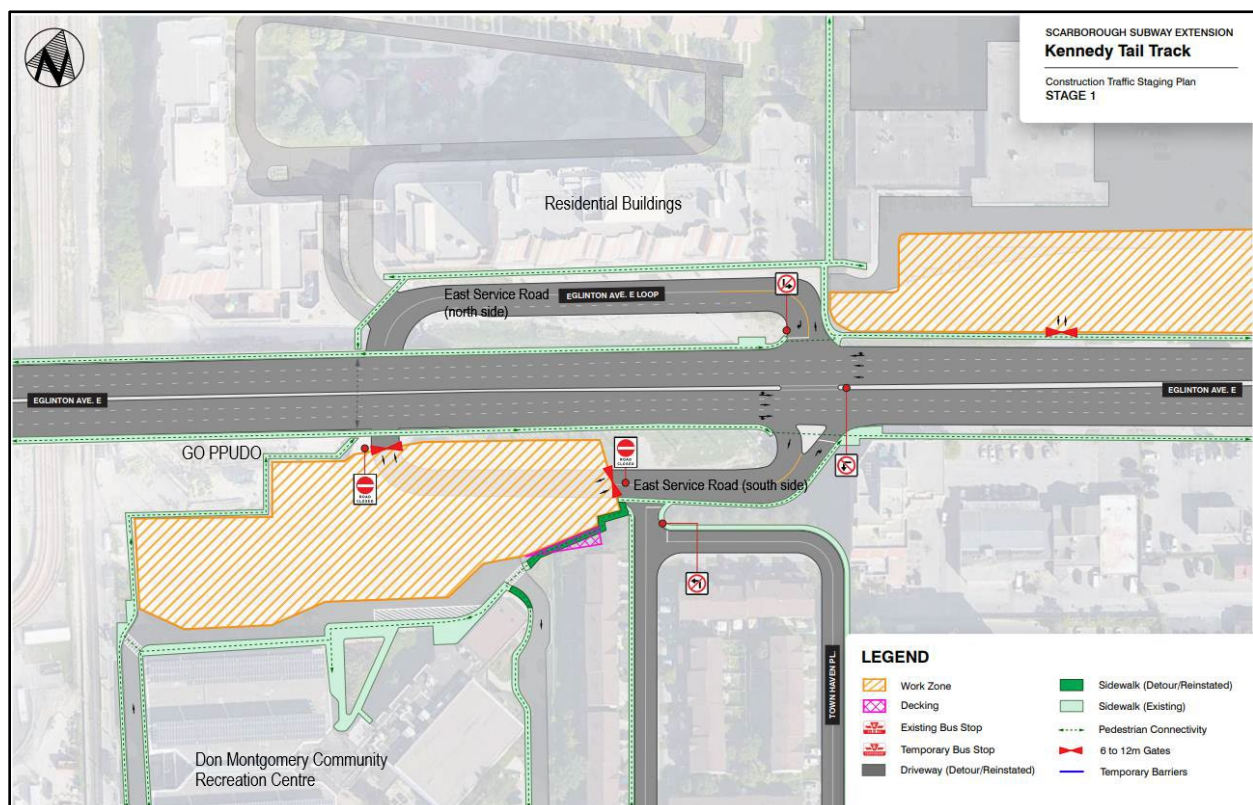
SSE-Kennedy Station connection Construction – Stage 1
